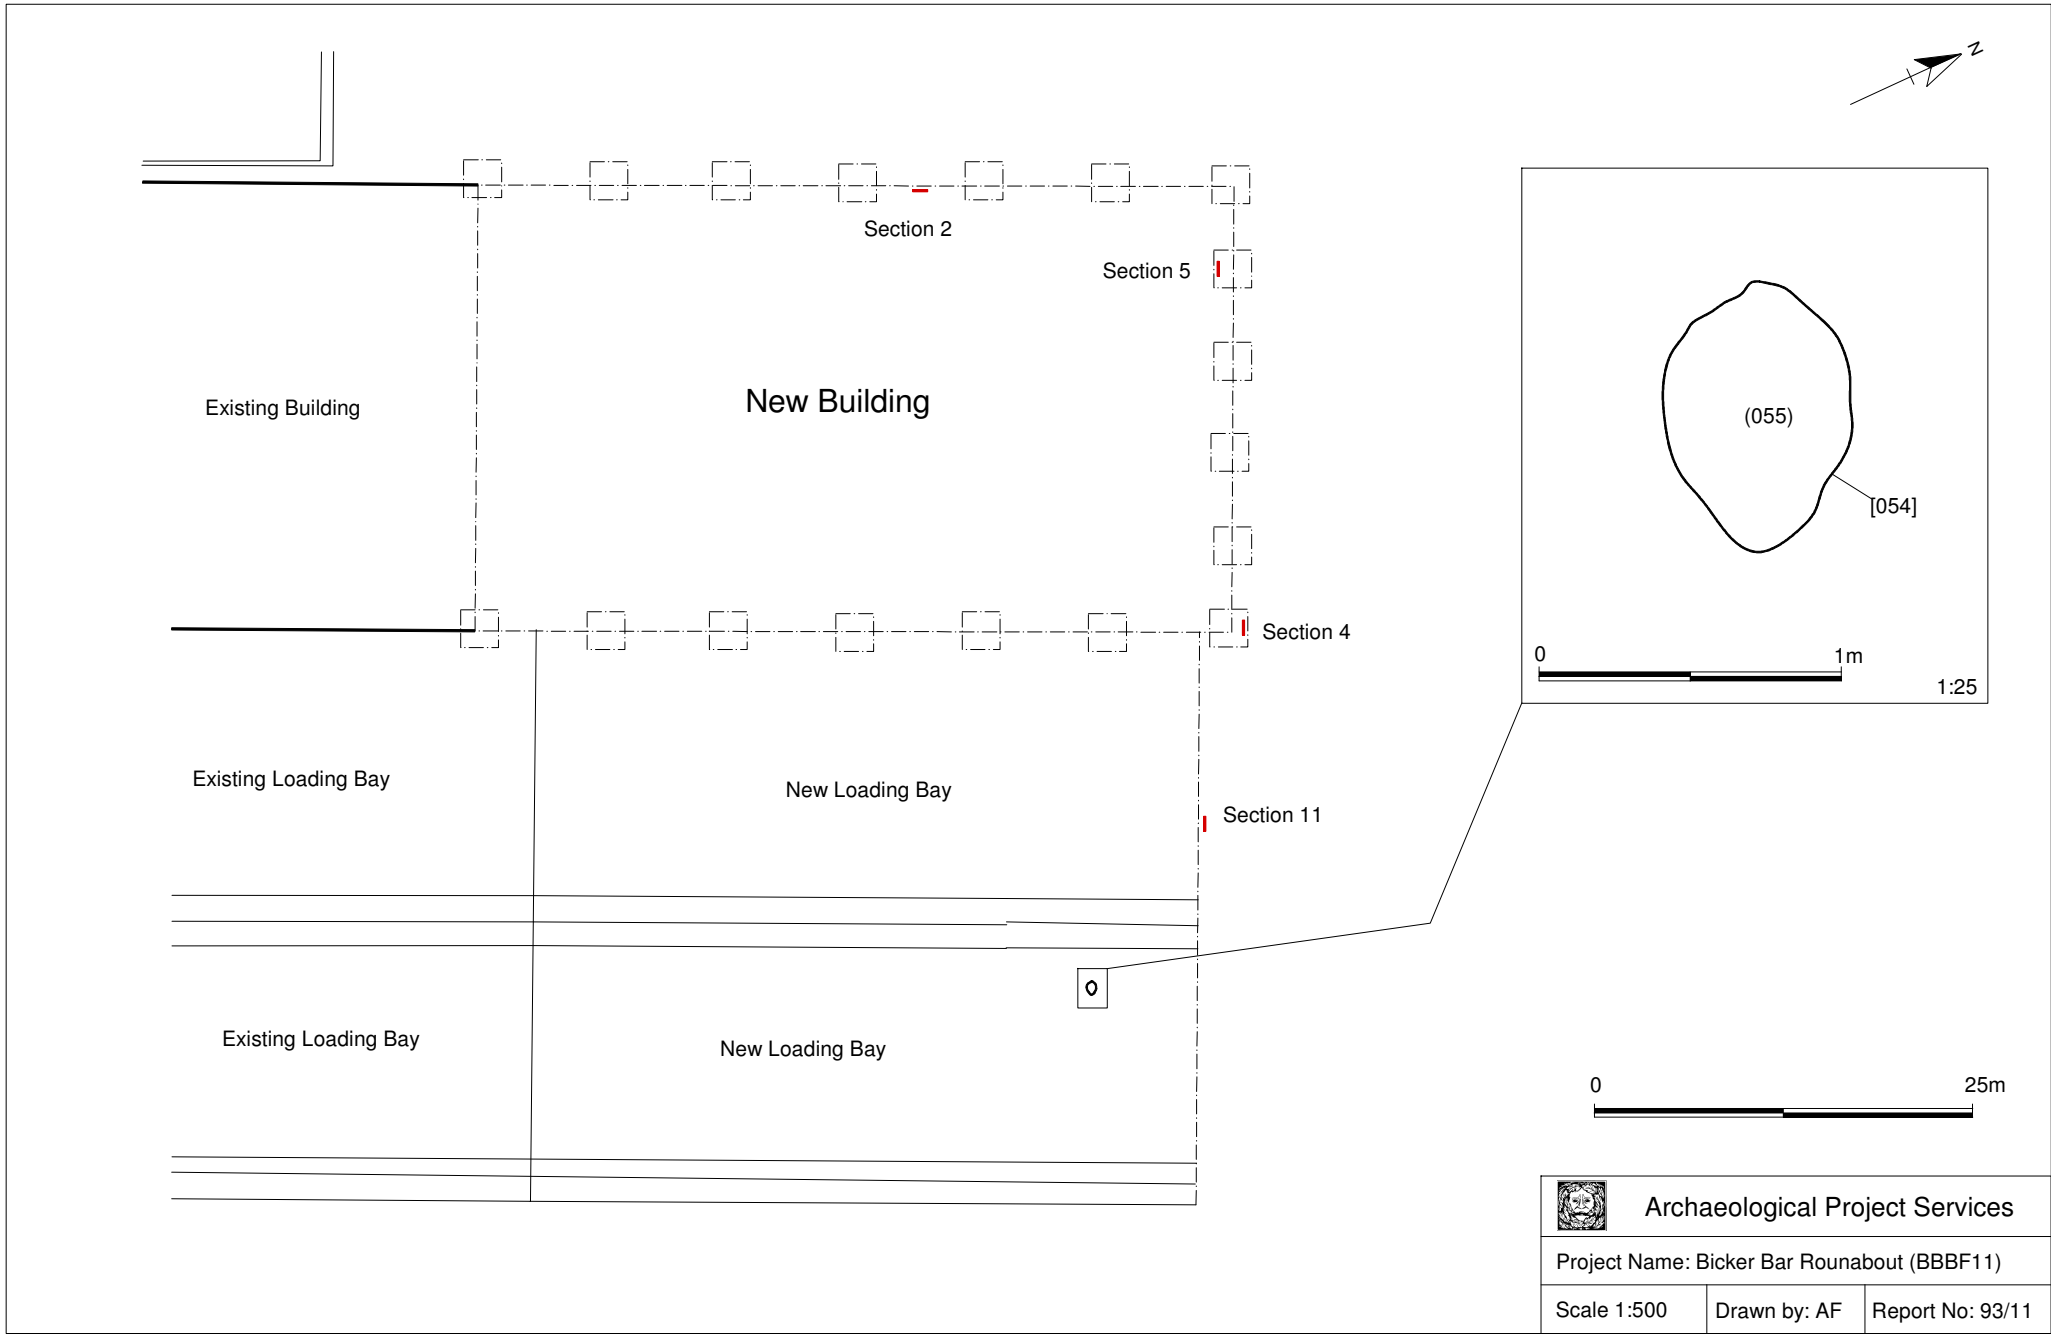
Plan showing the location of Sections 2, 4-5, 11 and pit [054]
